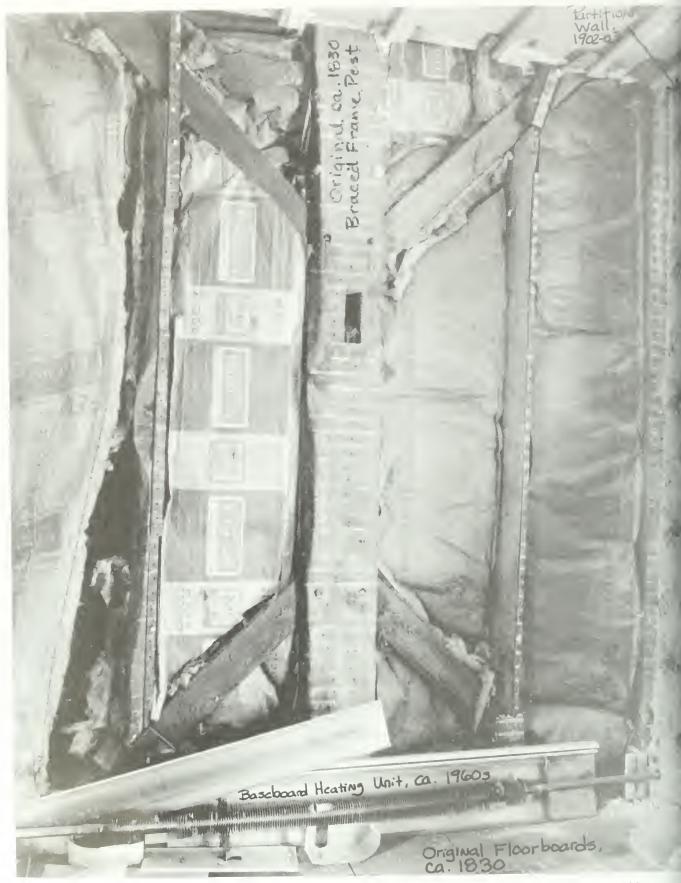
Stanton House: second-story hall, detail of braced-frame post at north wall, July 1982.
